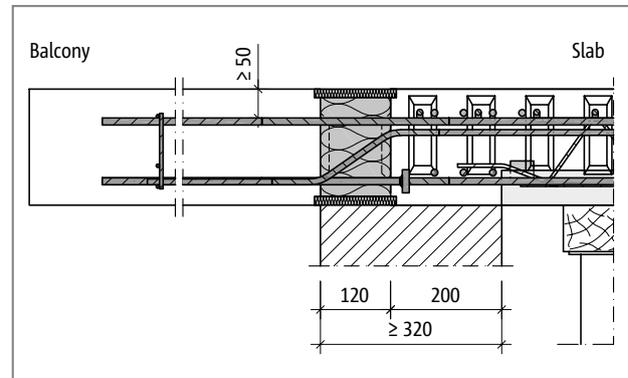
Schöck Isokorb® XT type C: Prefabricated slab with edge support with thermal insulating masonry (section XT type C-R-CV50, view XT type C-L-CV35)
